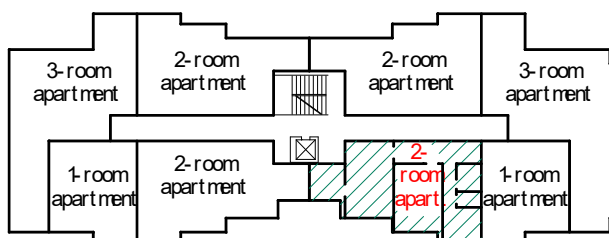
Layout of the 3rd floor of a two-room apartment where an explosion of gas accumulated in the premises occurred
